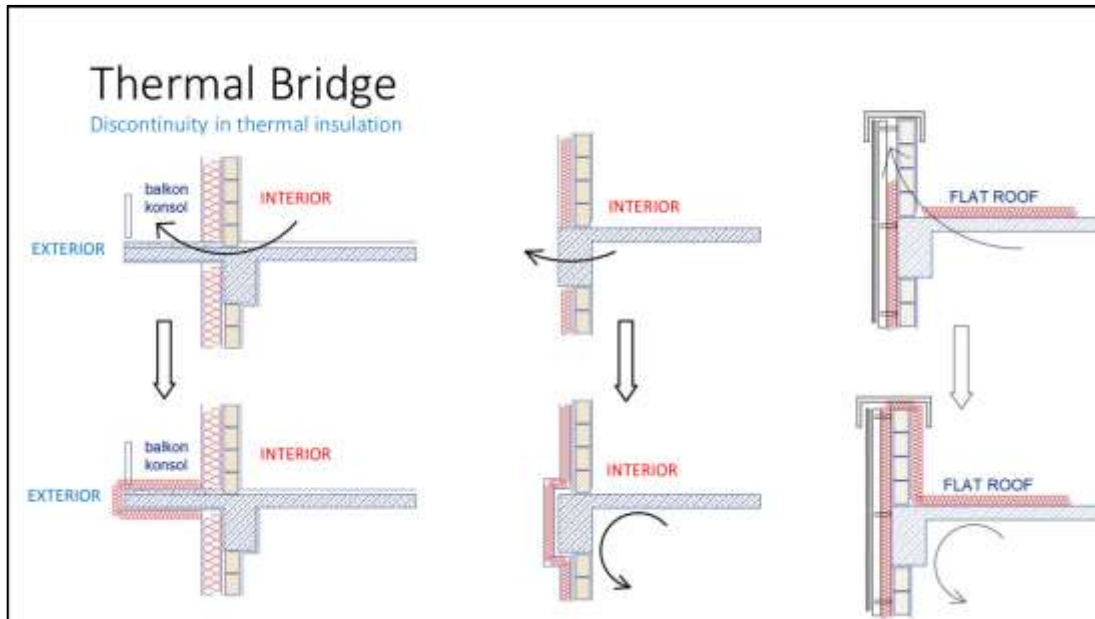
Thermal Bridge Examples and Possible Solutions for Walls.
